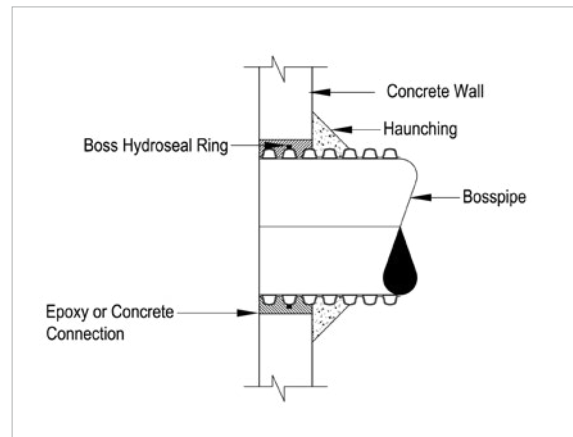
Manhole Connection with a Boss Hydroseal ring
